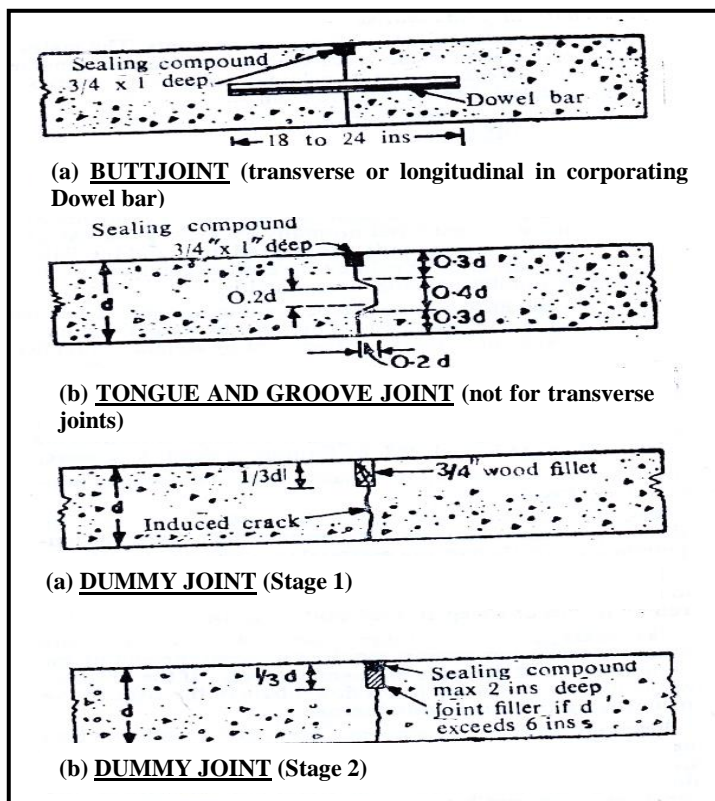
Typical Contraction Joints in Concrete Pavements
